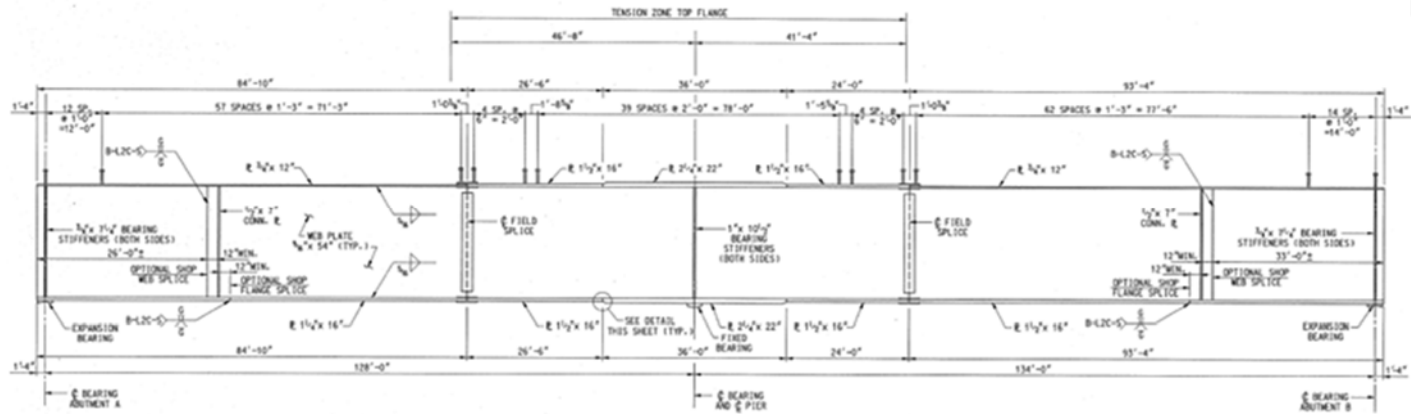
SR 299 Over SR 1 Girder Elevation
